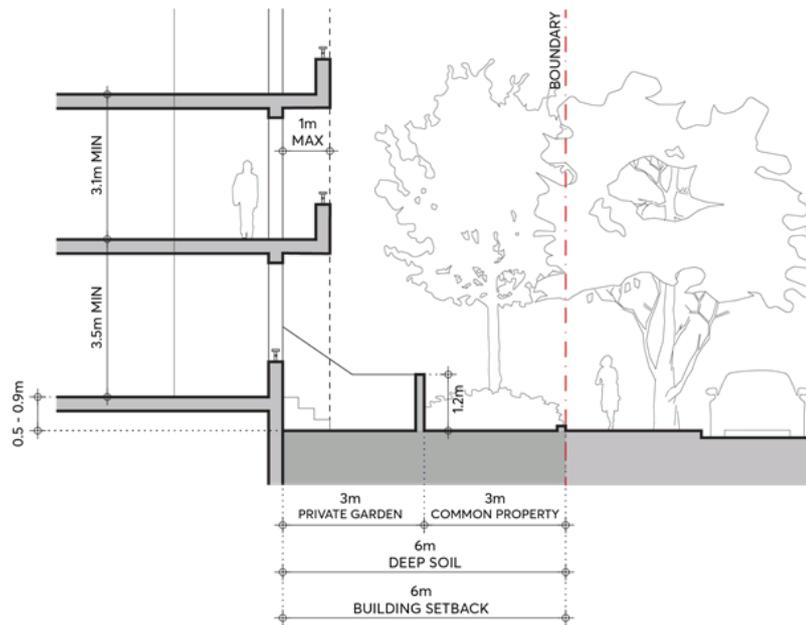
Ground floor interface and floor to floor heights
